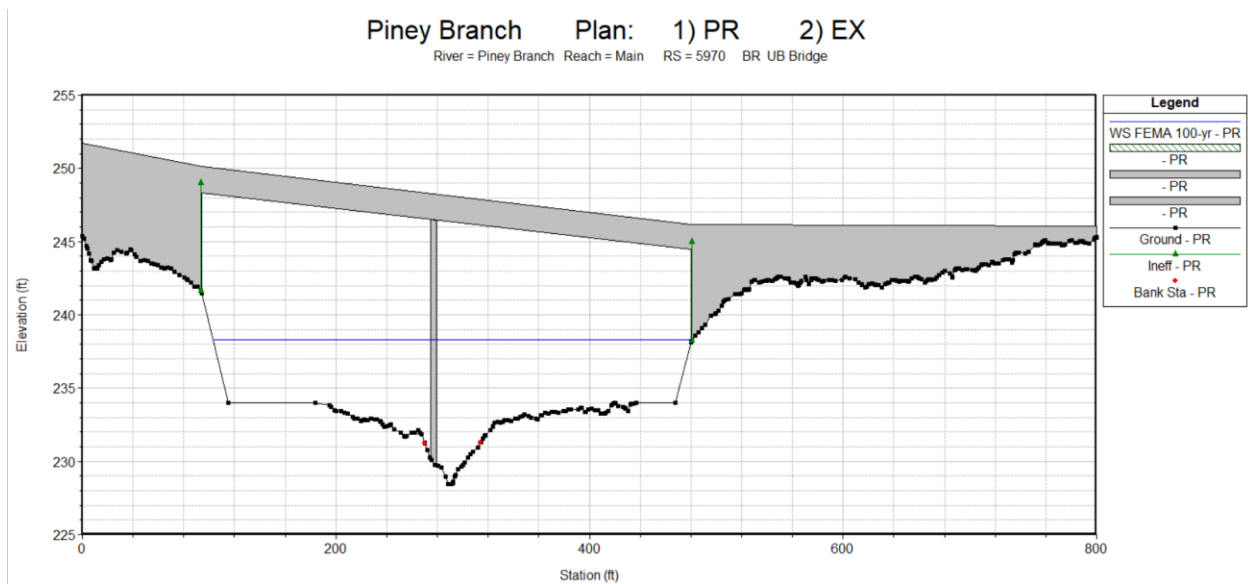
Bridge Downstream Internal Cross Section Proposed Geometry
